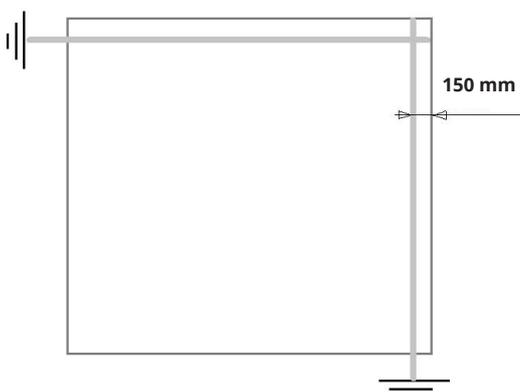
Earthing strip layout small area, less than 10 m x 10 m.
